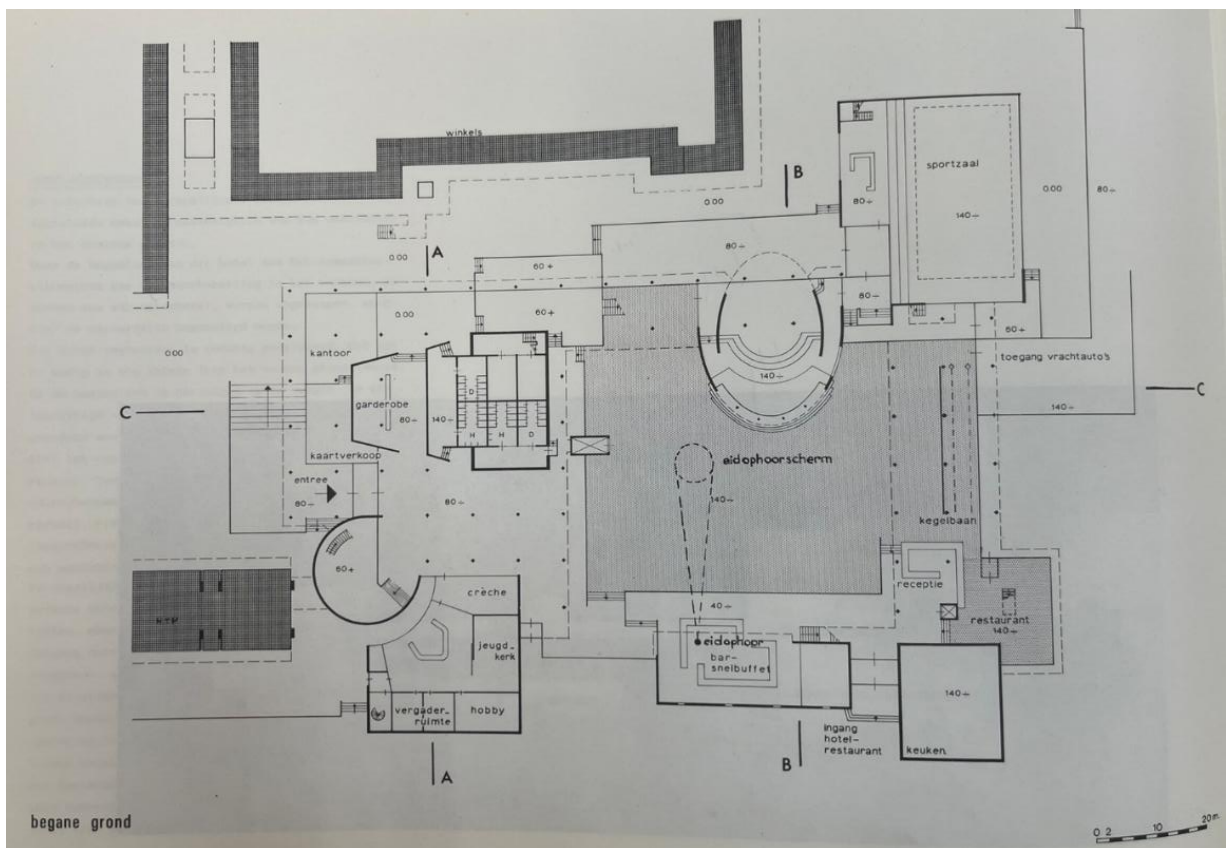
, Ground floor plan of Agora in Lelystad (NI Archive, n.d.)
